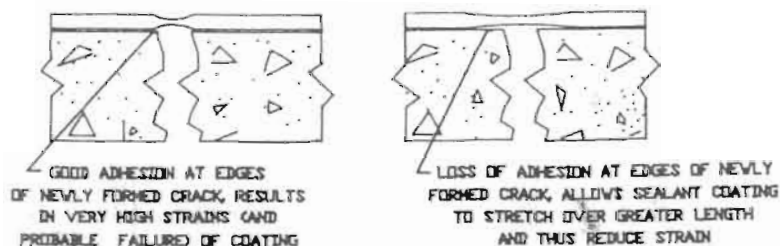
Diagrams showing how sealant coatings bridge cracks better if their adhesion fails.
